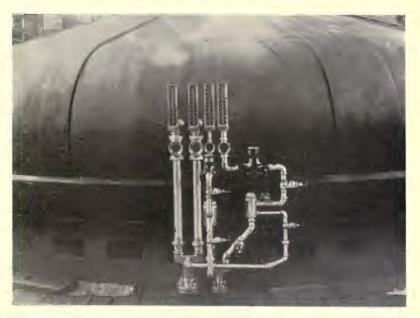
Oil Piping Arrangement, Showing Indicators.
